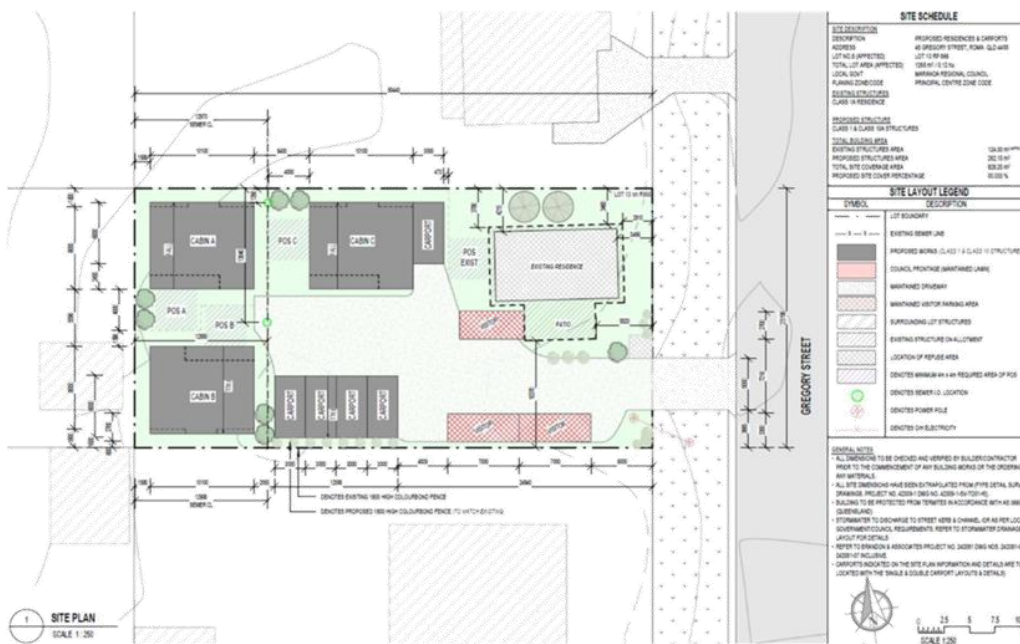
Proposed Site Plan (Source: Brandon & Associates)
